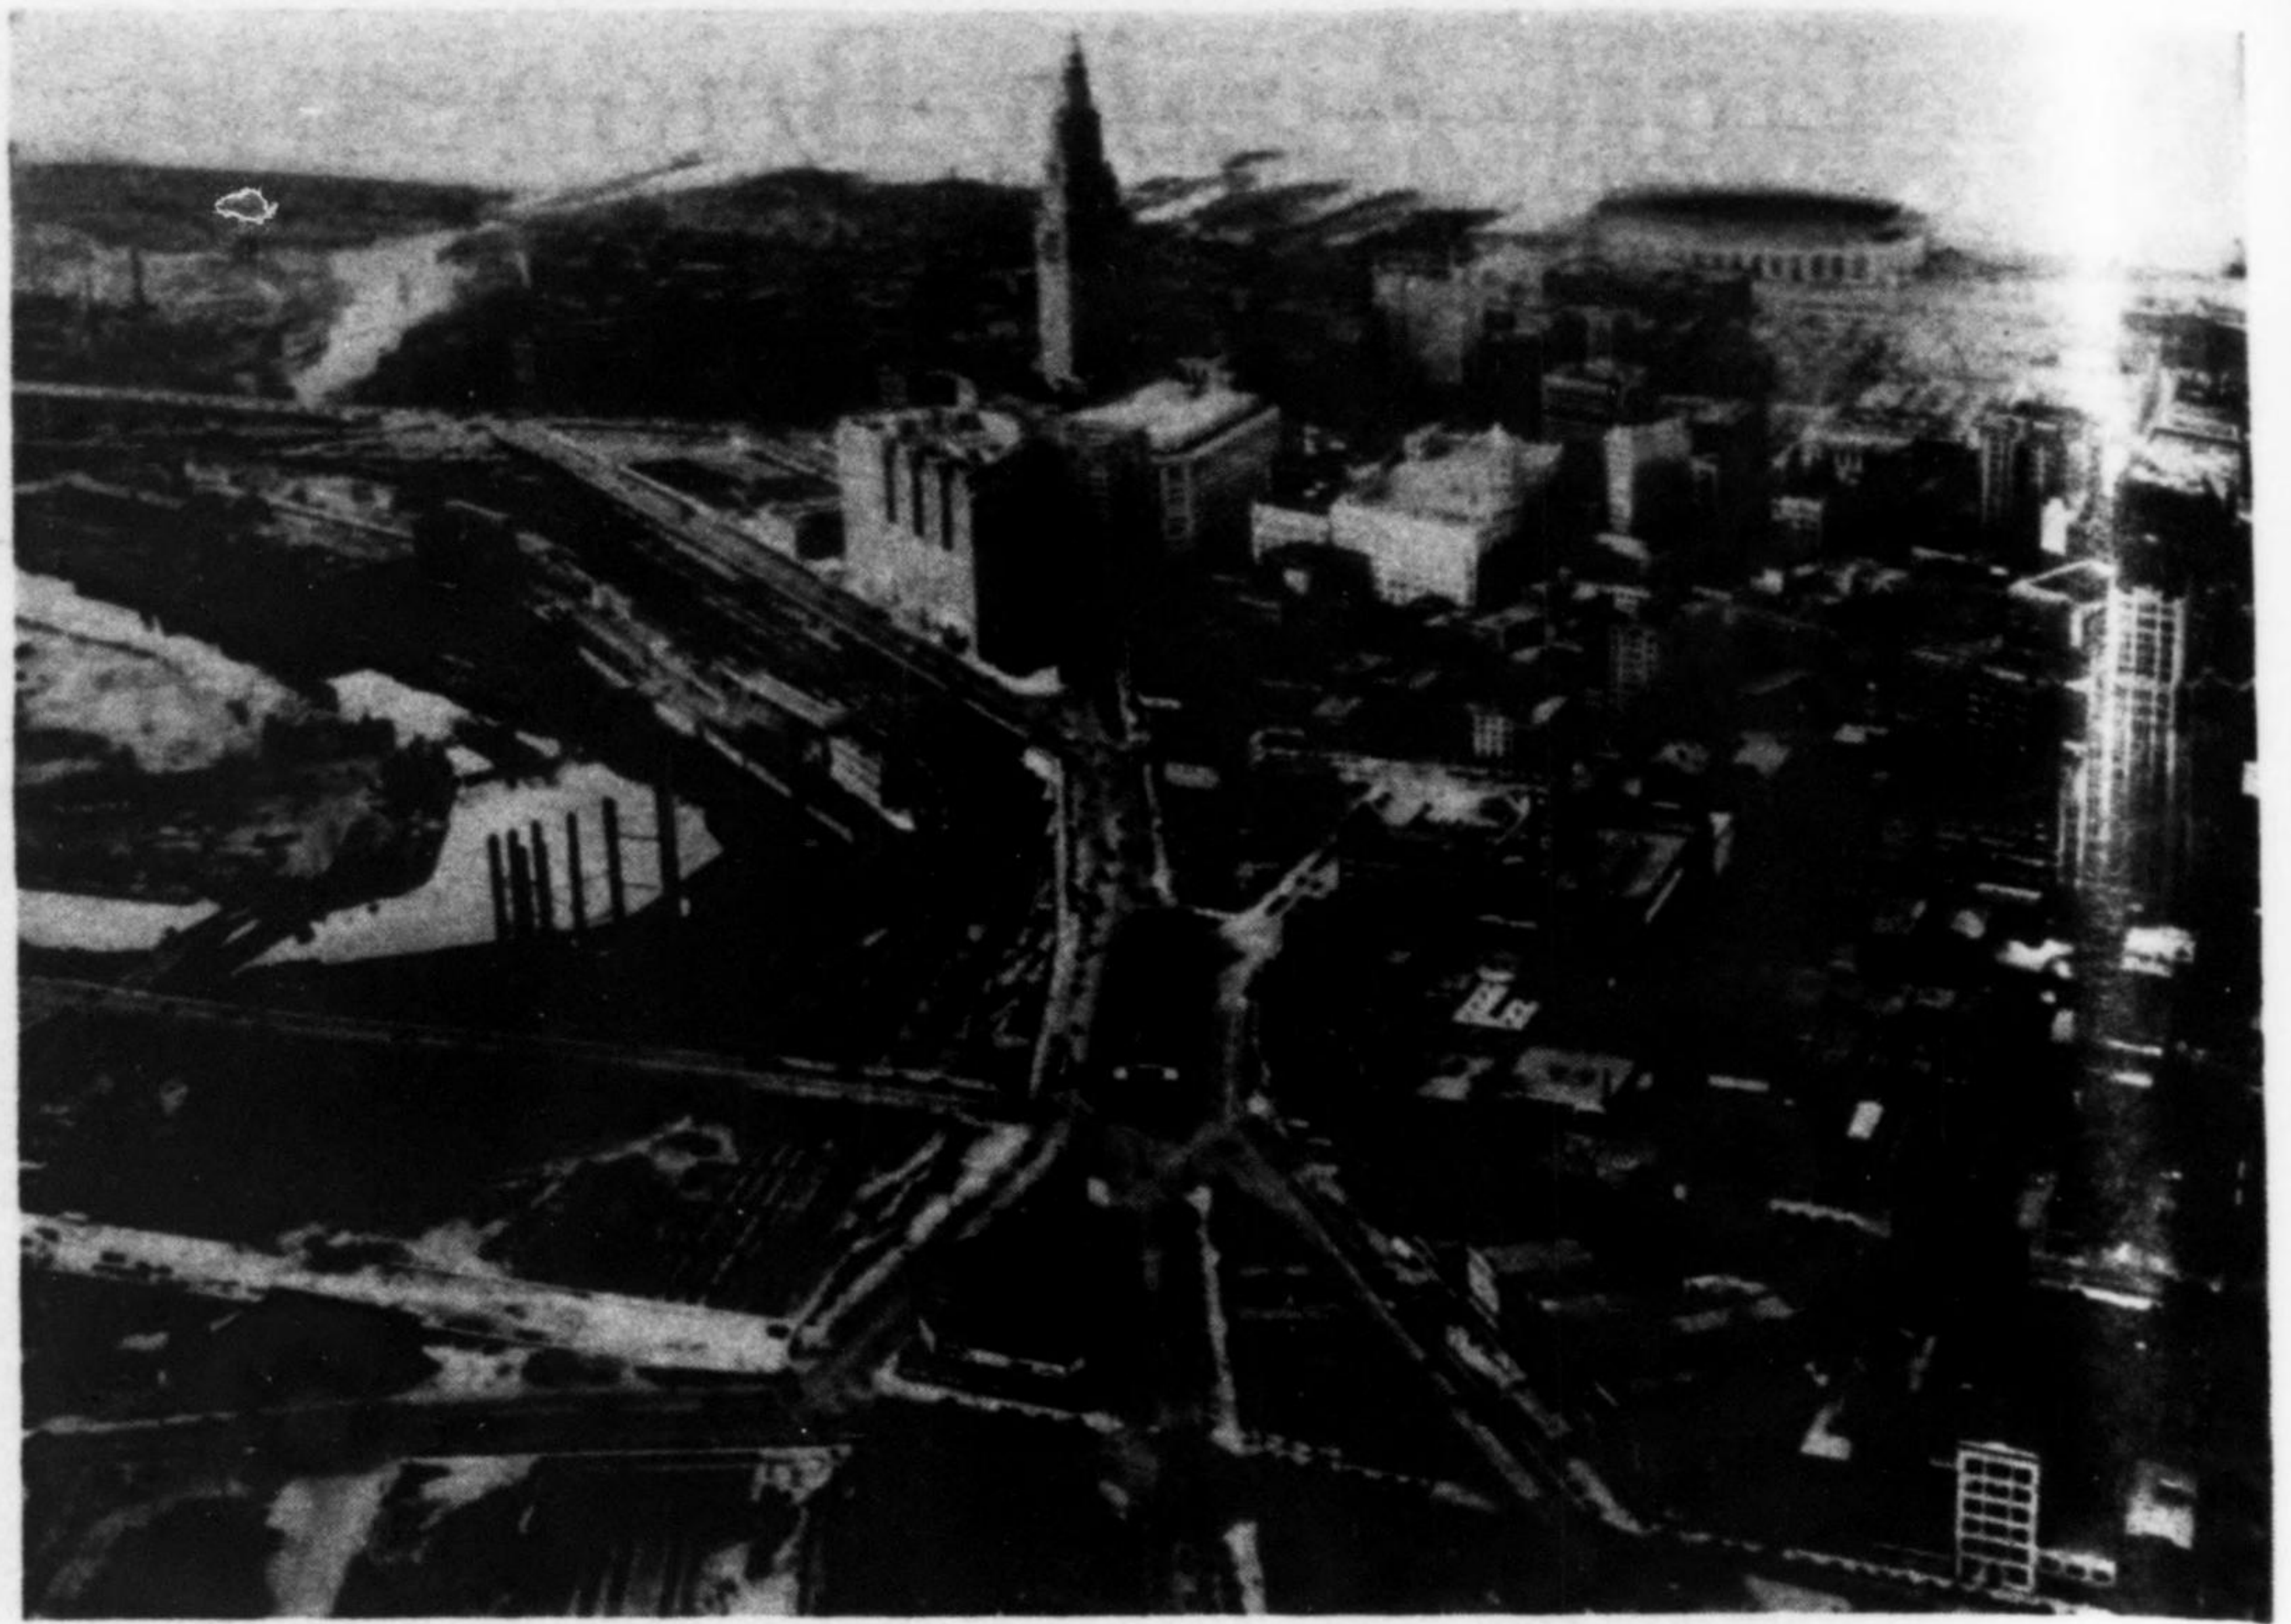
East plaza of Lorain-Carnegie bridge before widening of Central Ave., showing location of bridge with relation to Cleveland business section.
